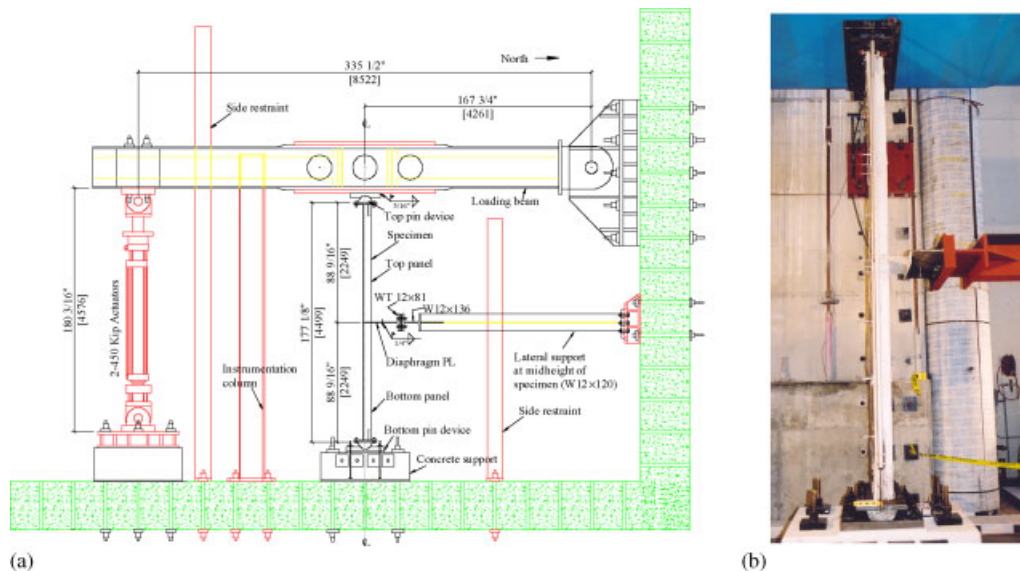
Bridge deck test set-up: (a) schematic; and (b) elevation.
